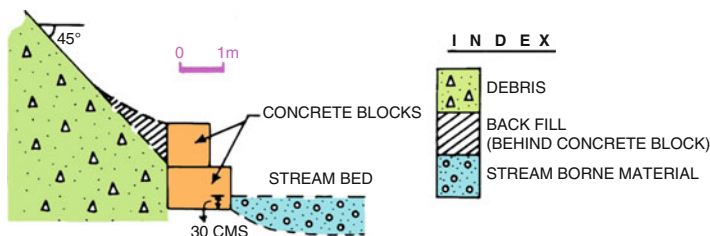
Sectional sketch of concrete cubes, acting as toe wall for protecting side slopes of Balia Stream in Kailakhan area
